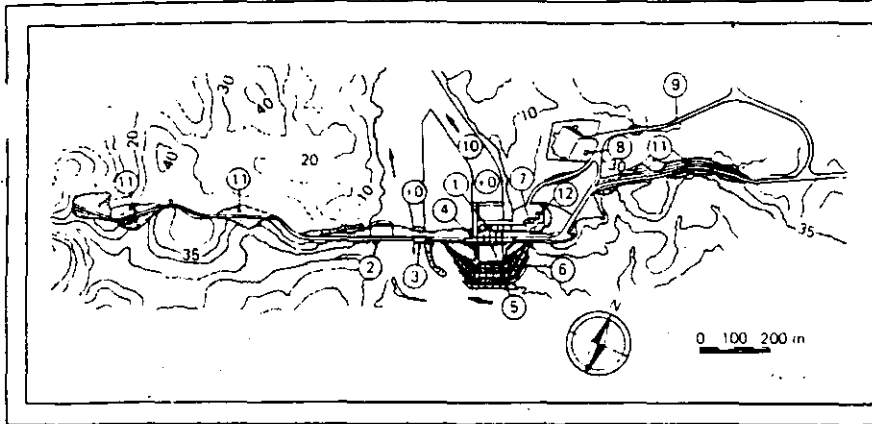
Overall plan view of the scheme, where: 1 = power station; 2 = spillway; 3 = bottom outlet; 4 = flap; 5 = intake; 6 = embankment for ecological purposes; 7 = maintenance building; 8 = surveillance building; 9 = access road; 10 = tailrace; 11 = earth dams; and, 12 = switchyard.
